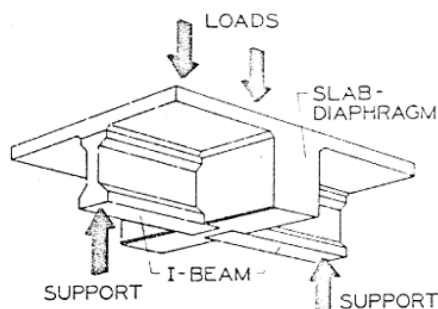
I-girder with slab extended strand test specimen (Salmons, 1974)
